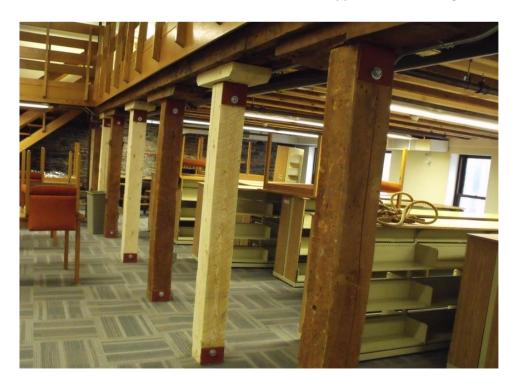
Old and new posts along the central running beam in the library. Looking southwest.
